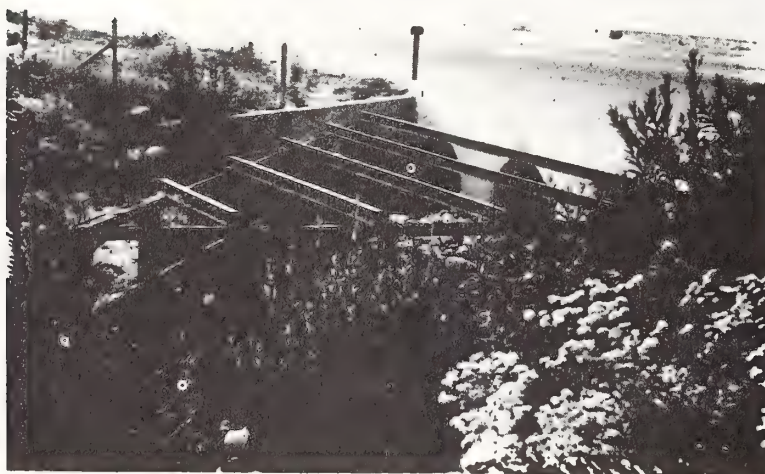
Steel rail debris deflector for battery of culverts (See Photo 7.)
